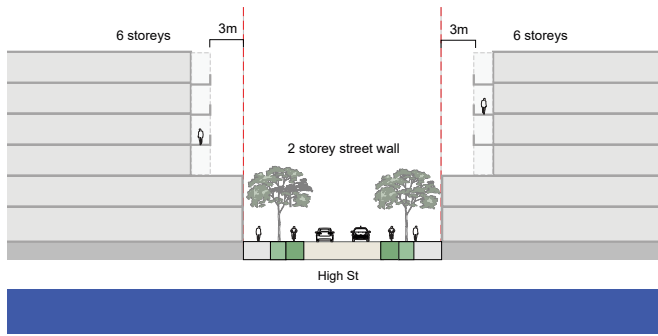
High Street, High Street North Precinct. A two-storey street wall height is proposed, consistent with the existing character.
